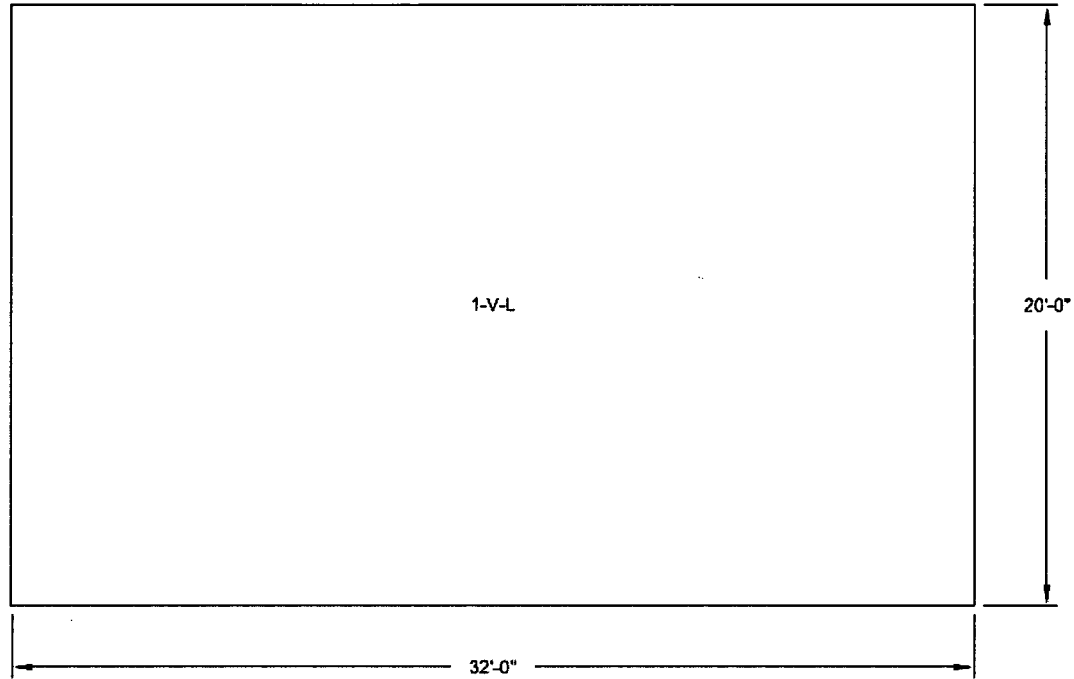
H.6-190 Wall 13 Looking From Outside Horizontal Reinforcement Zones
